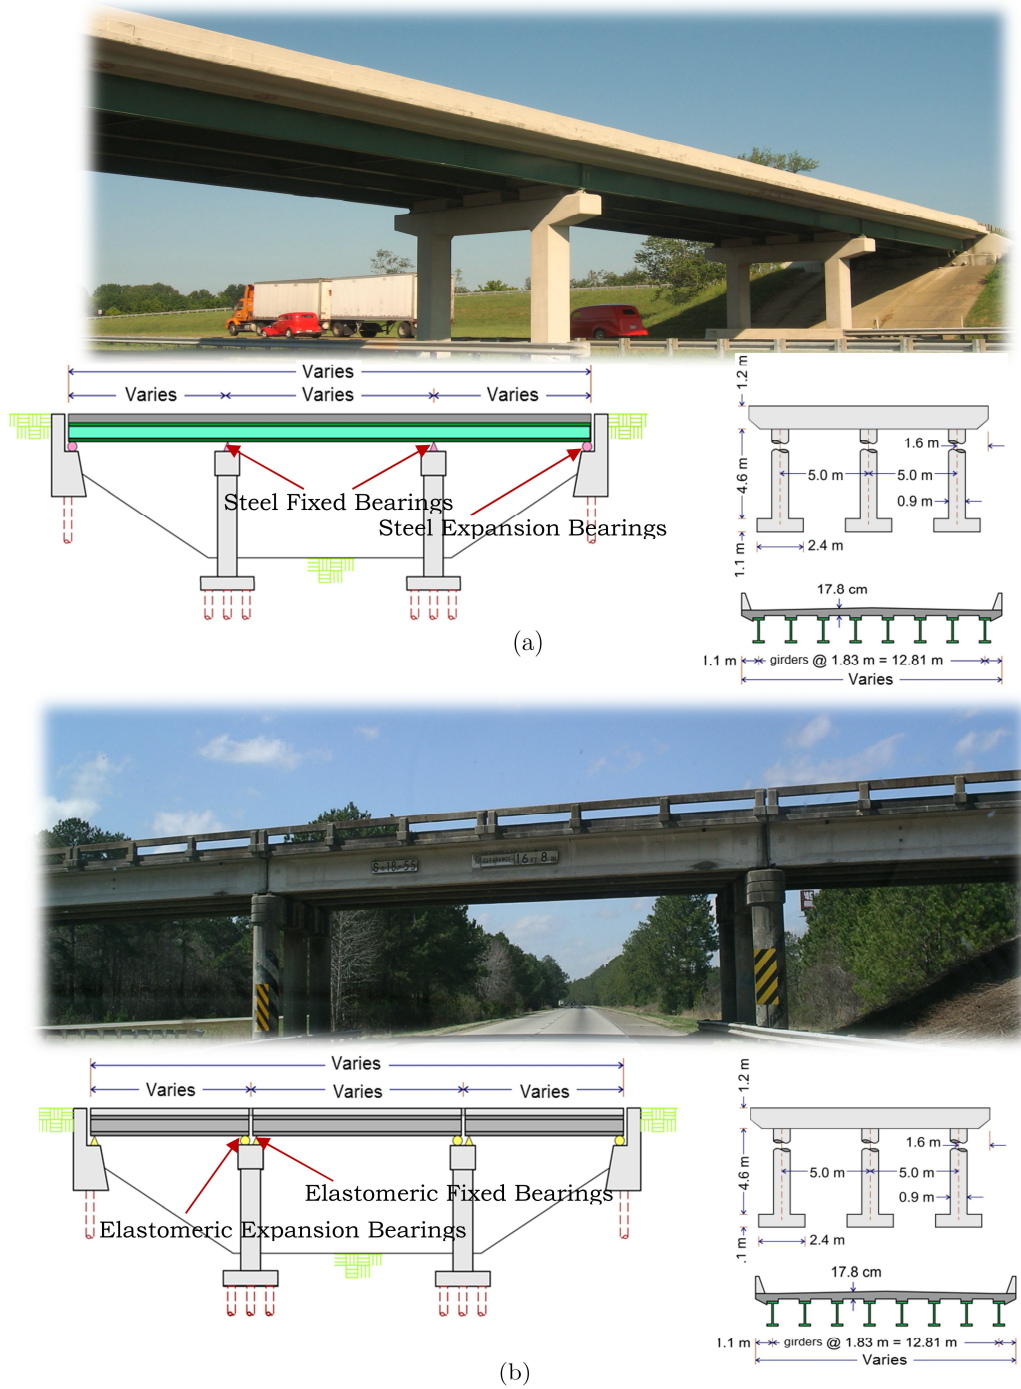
Typical geometry configuration of a) multi-span continuous (MSC) steel girder bridge, and b) multi-span simply supported (MSSS) steel girder bridges in Central and SouthEastern US. Photographs adopted from Padgett (2007).
